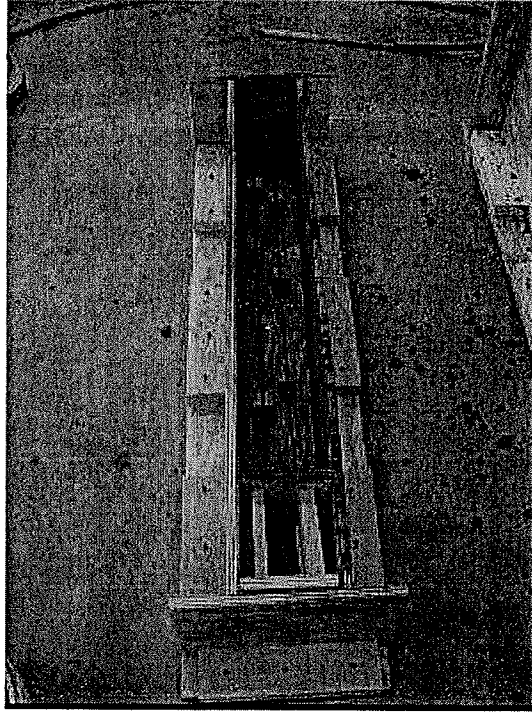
The chuck used to anchor the rebar along with the broken rebar.
